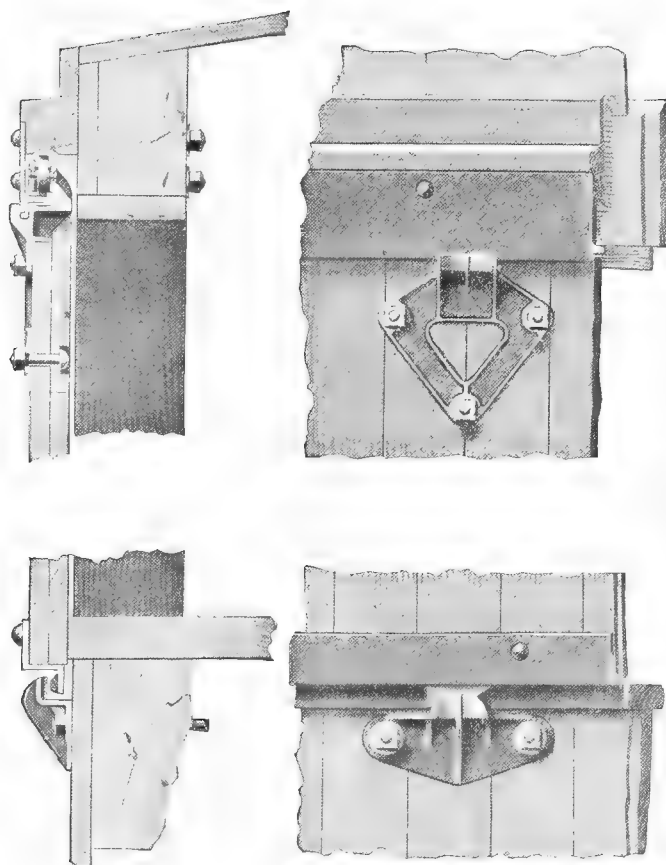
Detroit Door Fixtures. Hutchins Car Roofing Company.
